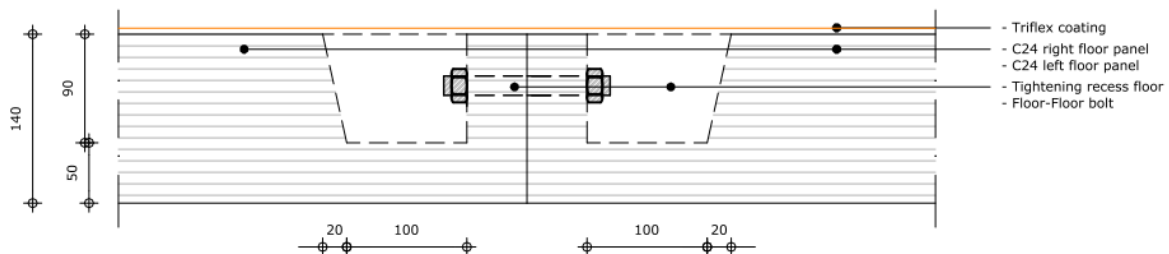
Cross-section A-A of Figure 10-7 preliminary floor-to-floor connection design in mm
